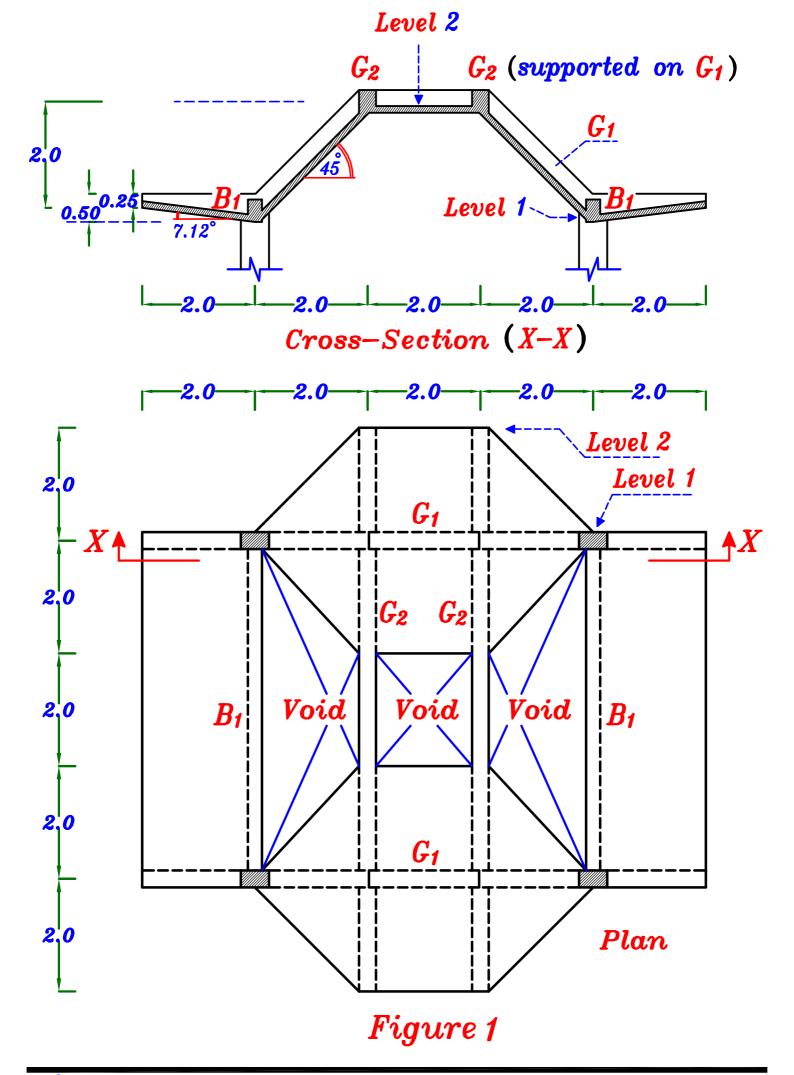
shows a sectional elevation and plan of a reinfocred concrete shed. The shed covered by reinforced concrete slabs supported by a system of secondary beams  $(B_1)$  and Girders  $(G_1 & G_2)$  It is required to:
